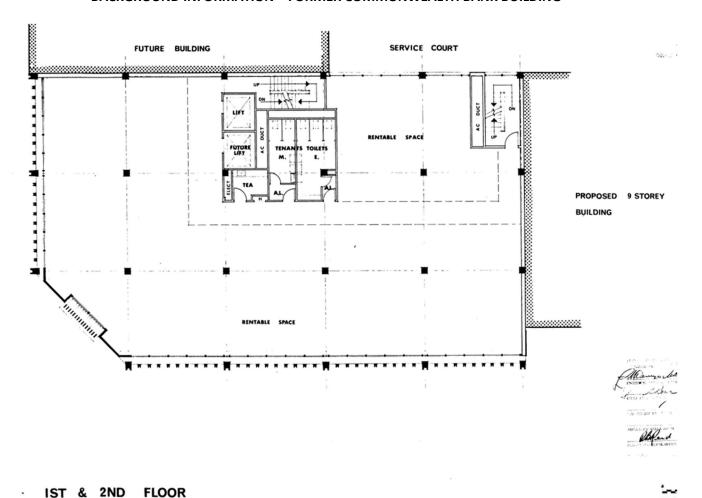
Former Commonwealth Bank Building, original first and second floor plans
